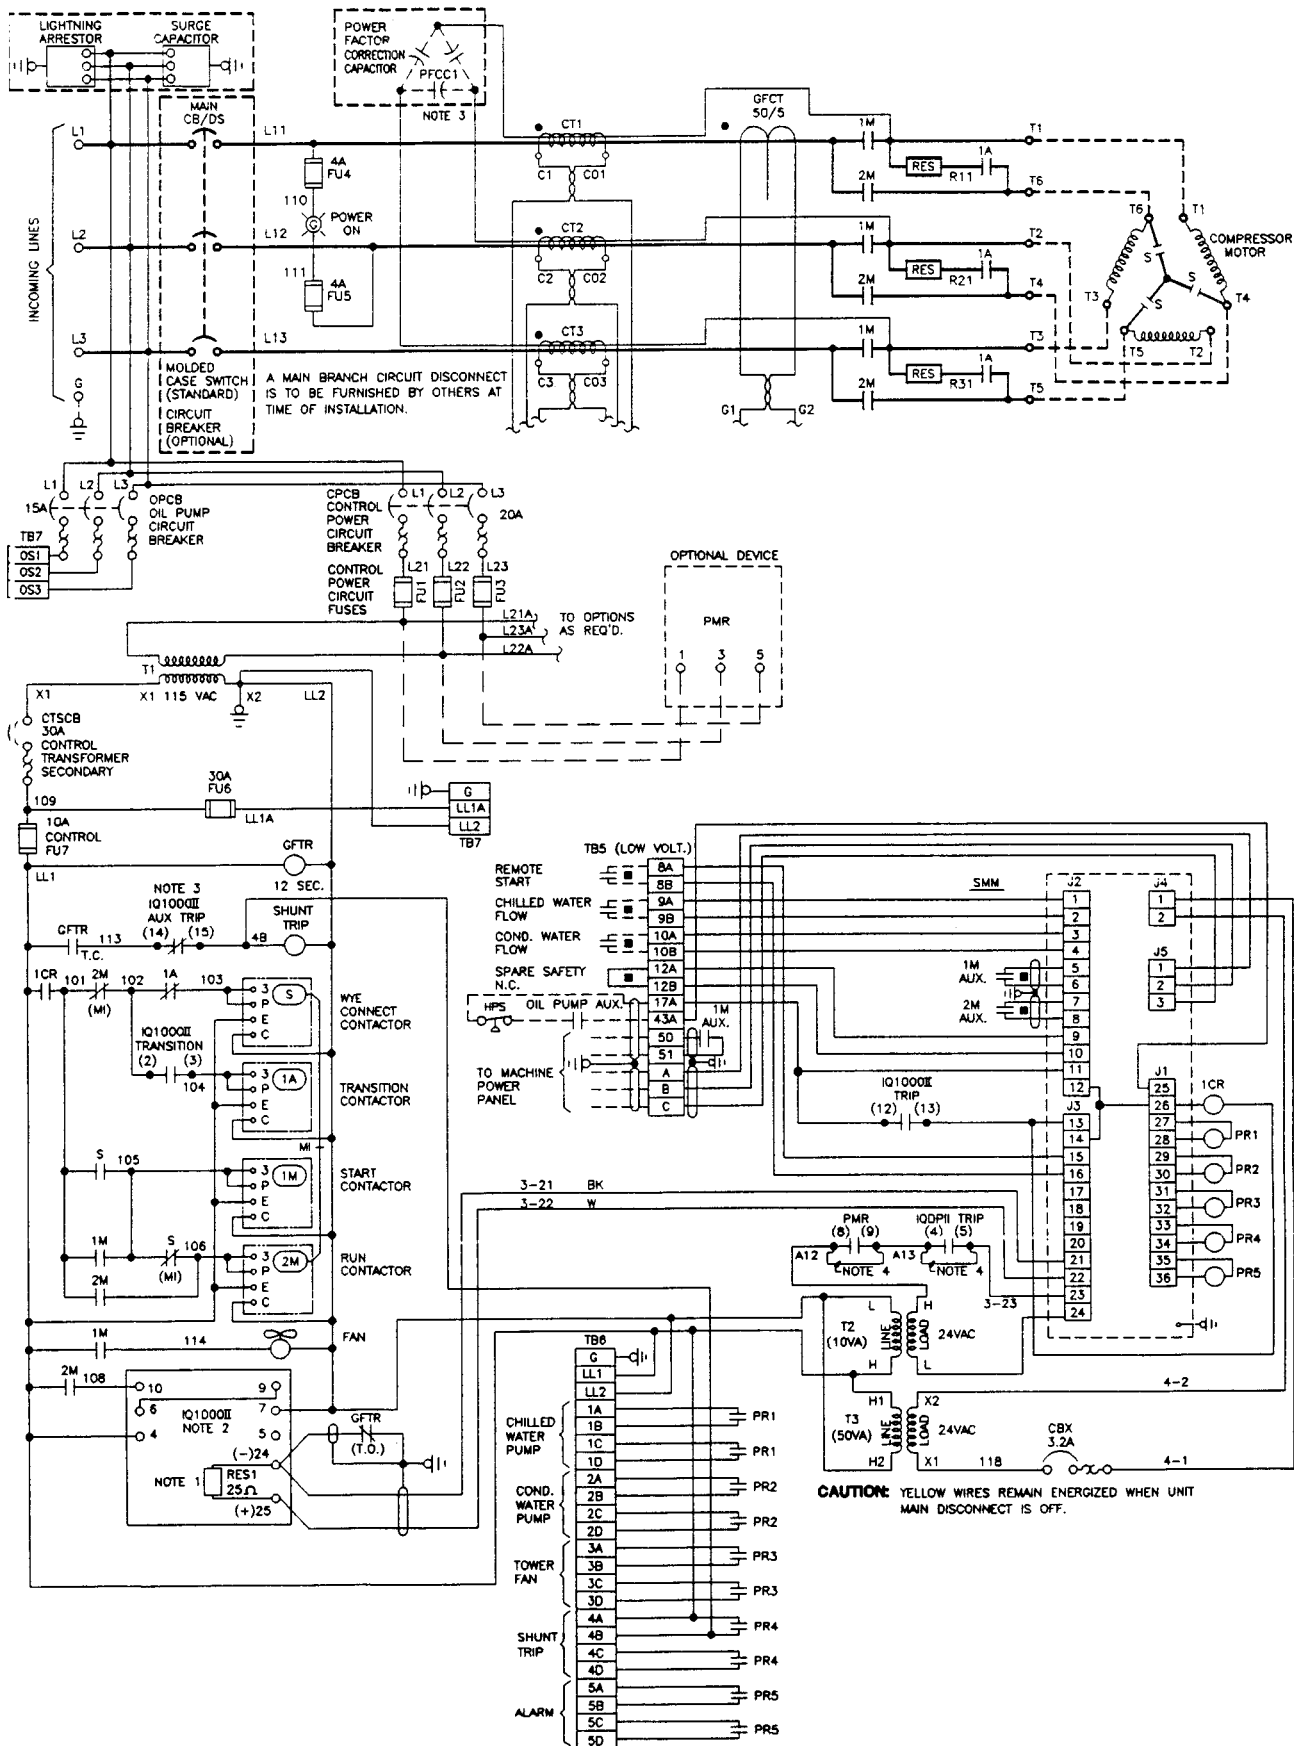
Cutler-Hammer (Wye-Delta) Unit Mounted Starter Wiring Schematic
